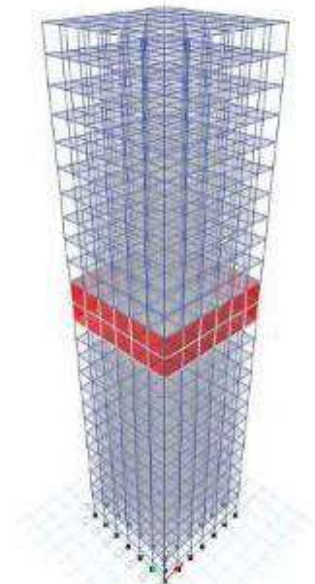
Perspective View Of A Storey At Outrigger Location Model 2 (With X Outriggers)
